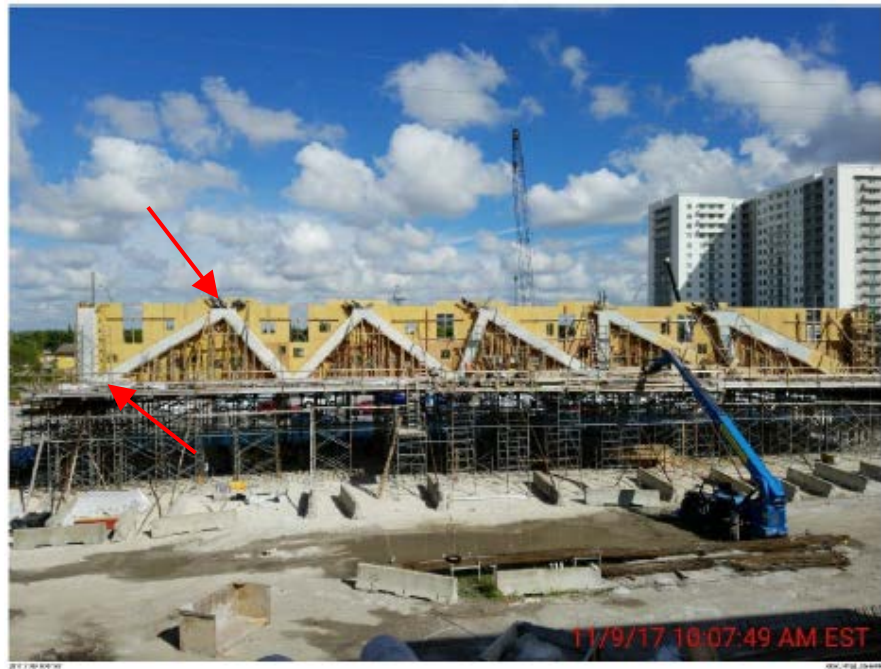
November 9, 2017: Truss form removal, location of construction joints indicated with red arrows.⁸²
